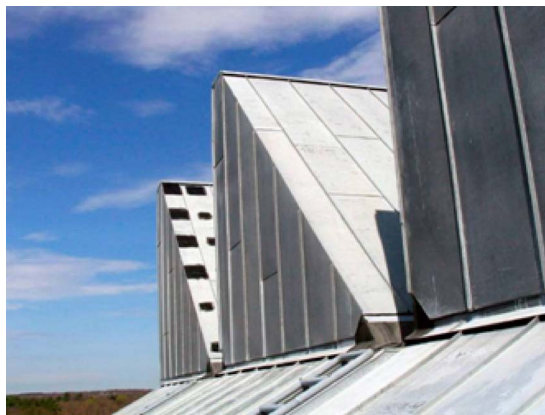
Classic four-span sawtooth roof building with windows installed in vertical wall of roof monitors
